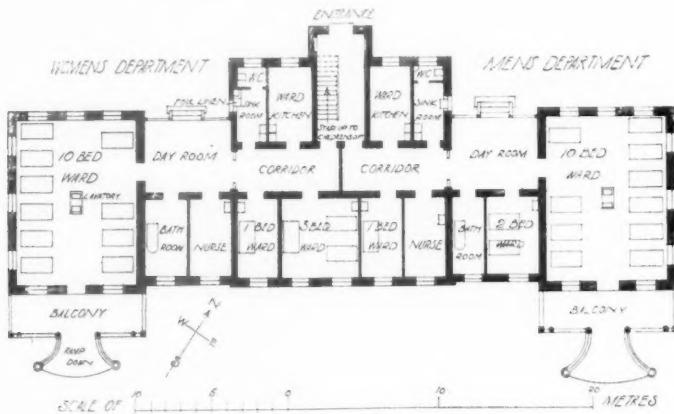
GROUND FLOOR PLAN OF SCARLET FEVER PAVILION,
